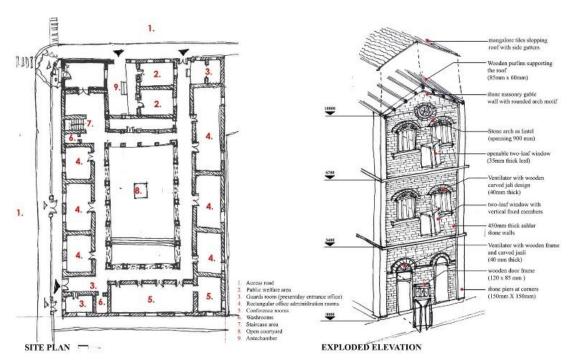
Case Example 3. Nana Wada, Budhwar Peth: Plan and Exploded Elevation Showing the Materiality and Construction Details
